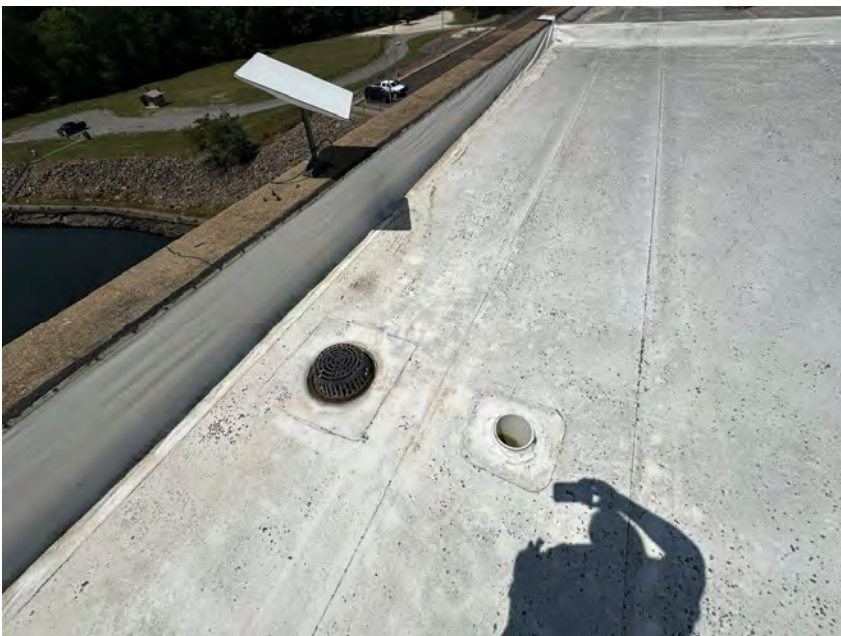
View of roof drains on south wall in east section of upper roof, along with antenna on parapet.
